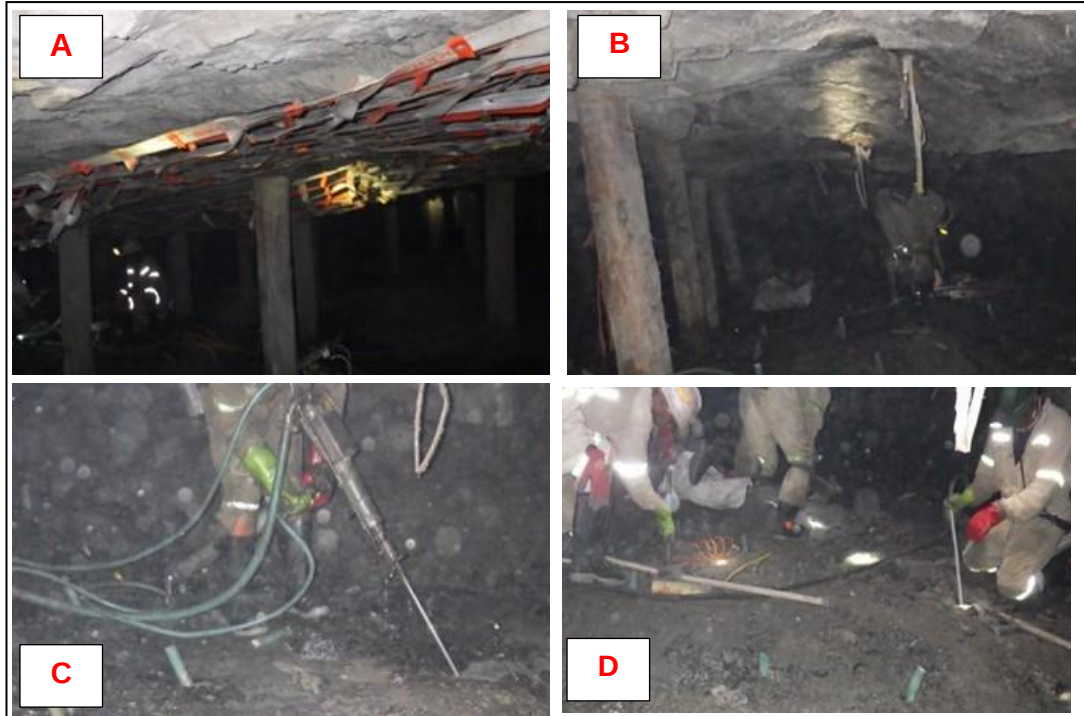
Photographs showing cable anchors pre-installed and footwall drilling.
